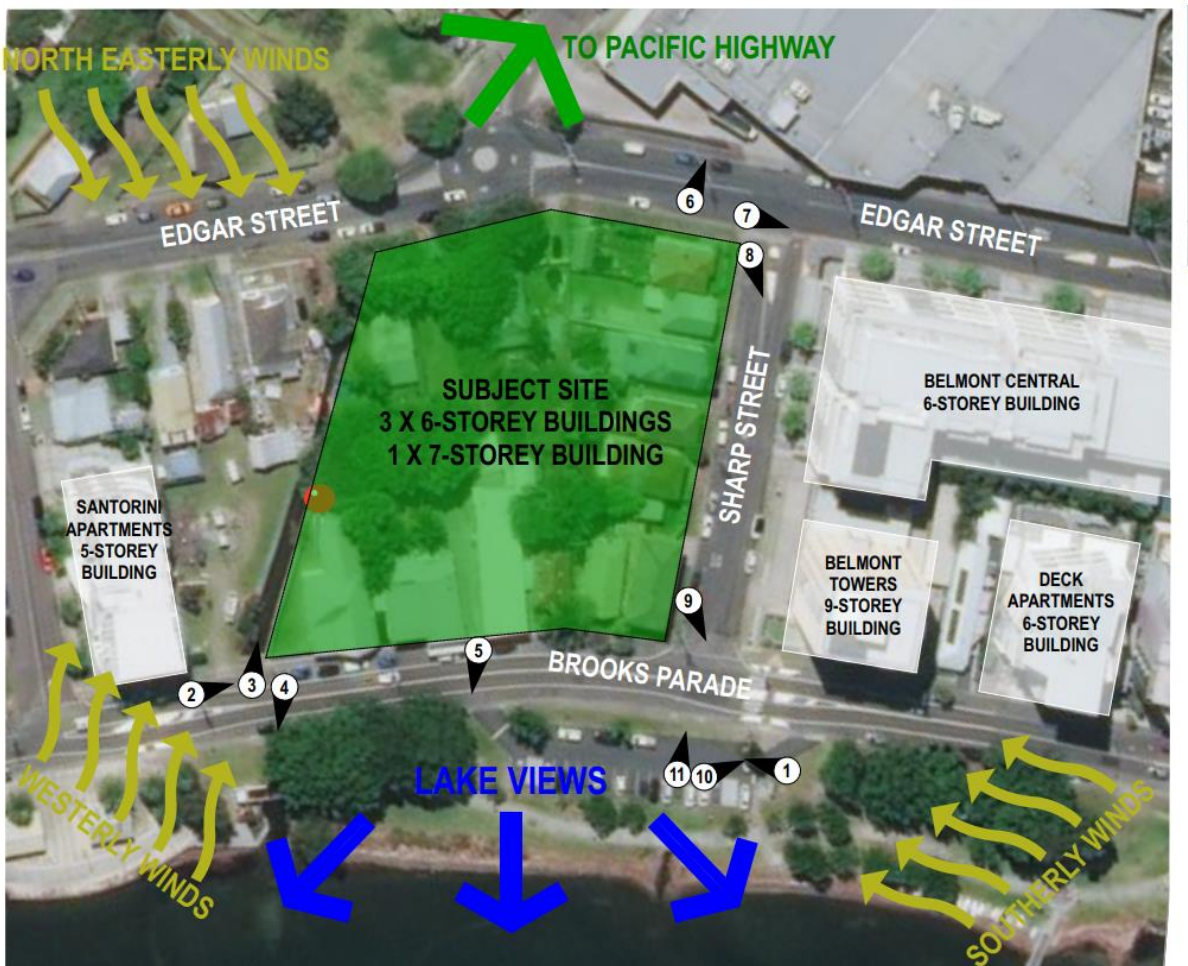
Site Analysis Plan - Drawing DA50-H Coeve Design
